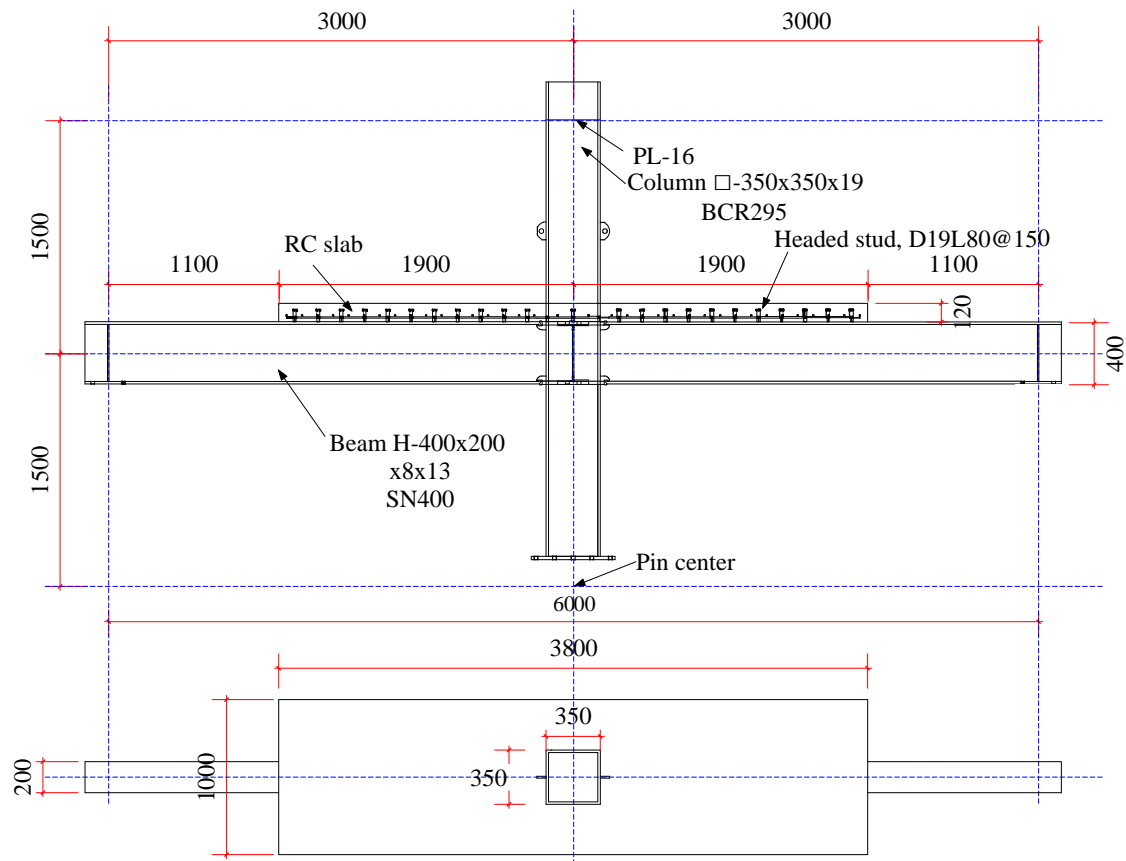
Test specimens: (a) Front elevation; (b) Plane view.
